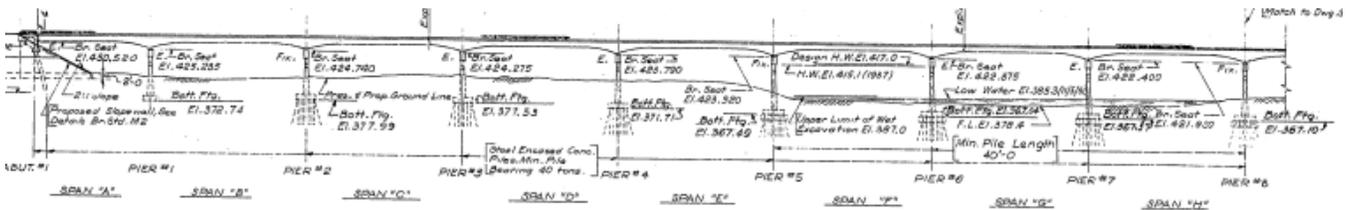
Original design drawings for the 1958 built-up riveted two-girder bridge.
